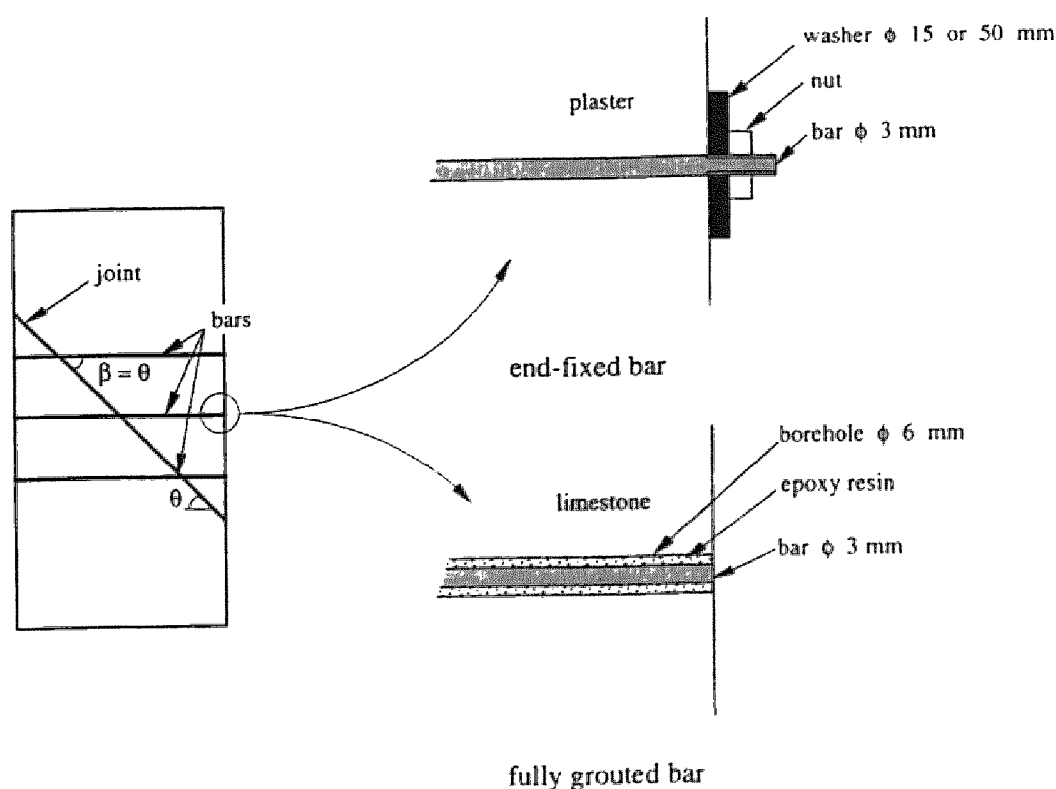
Scheme of the bar installation and detail of the fixing system
